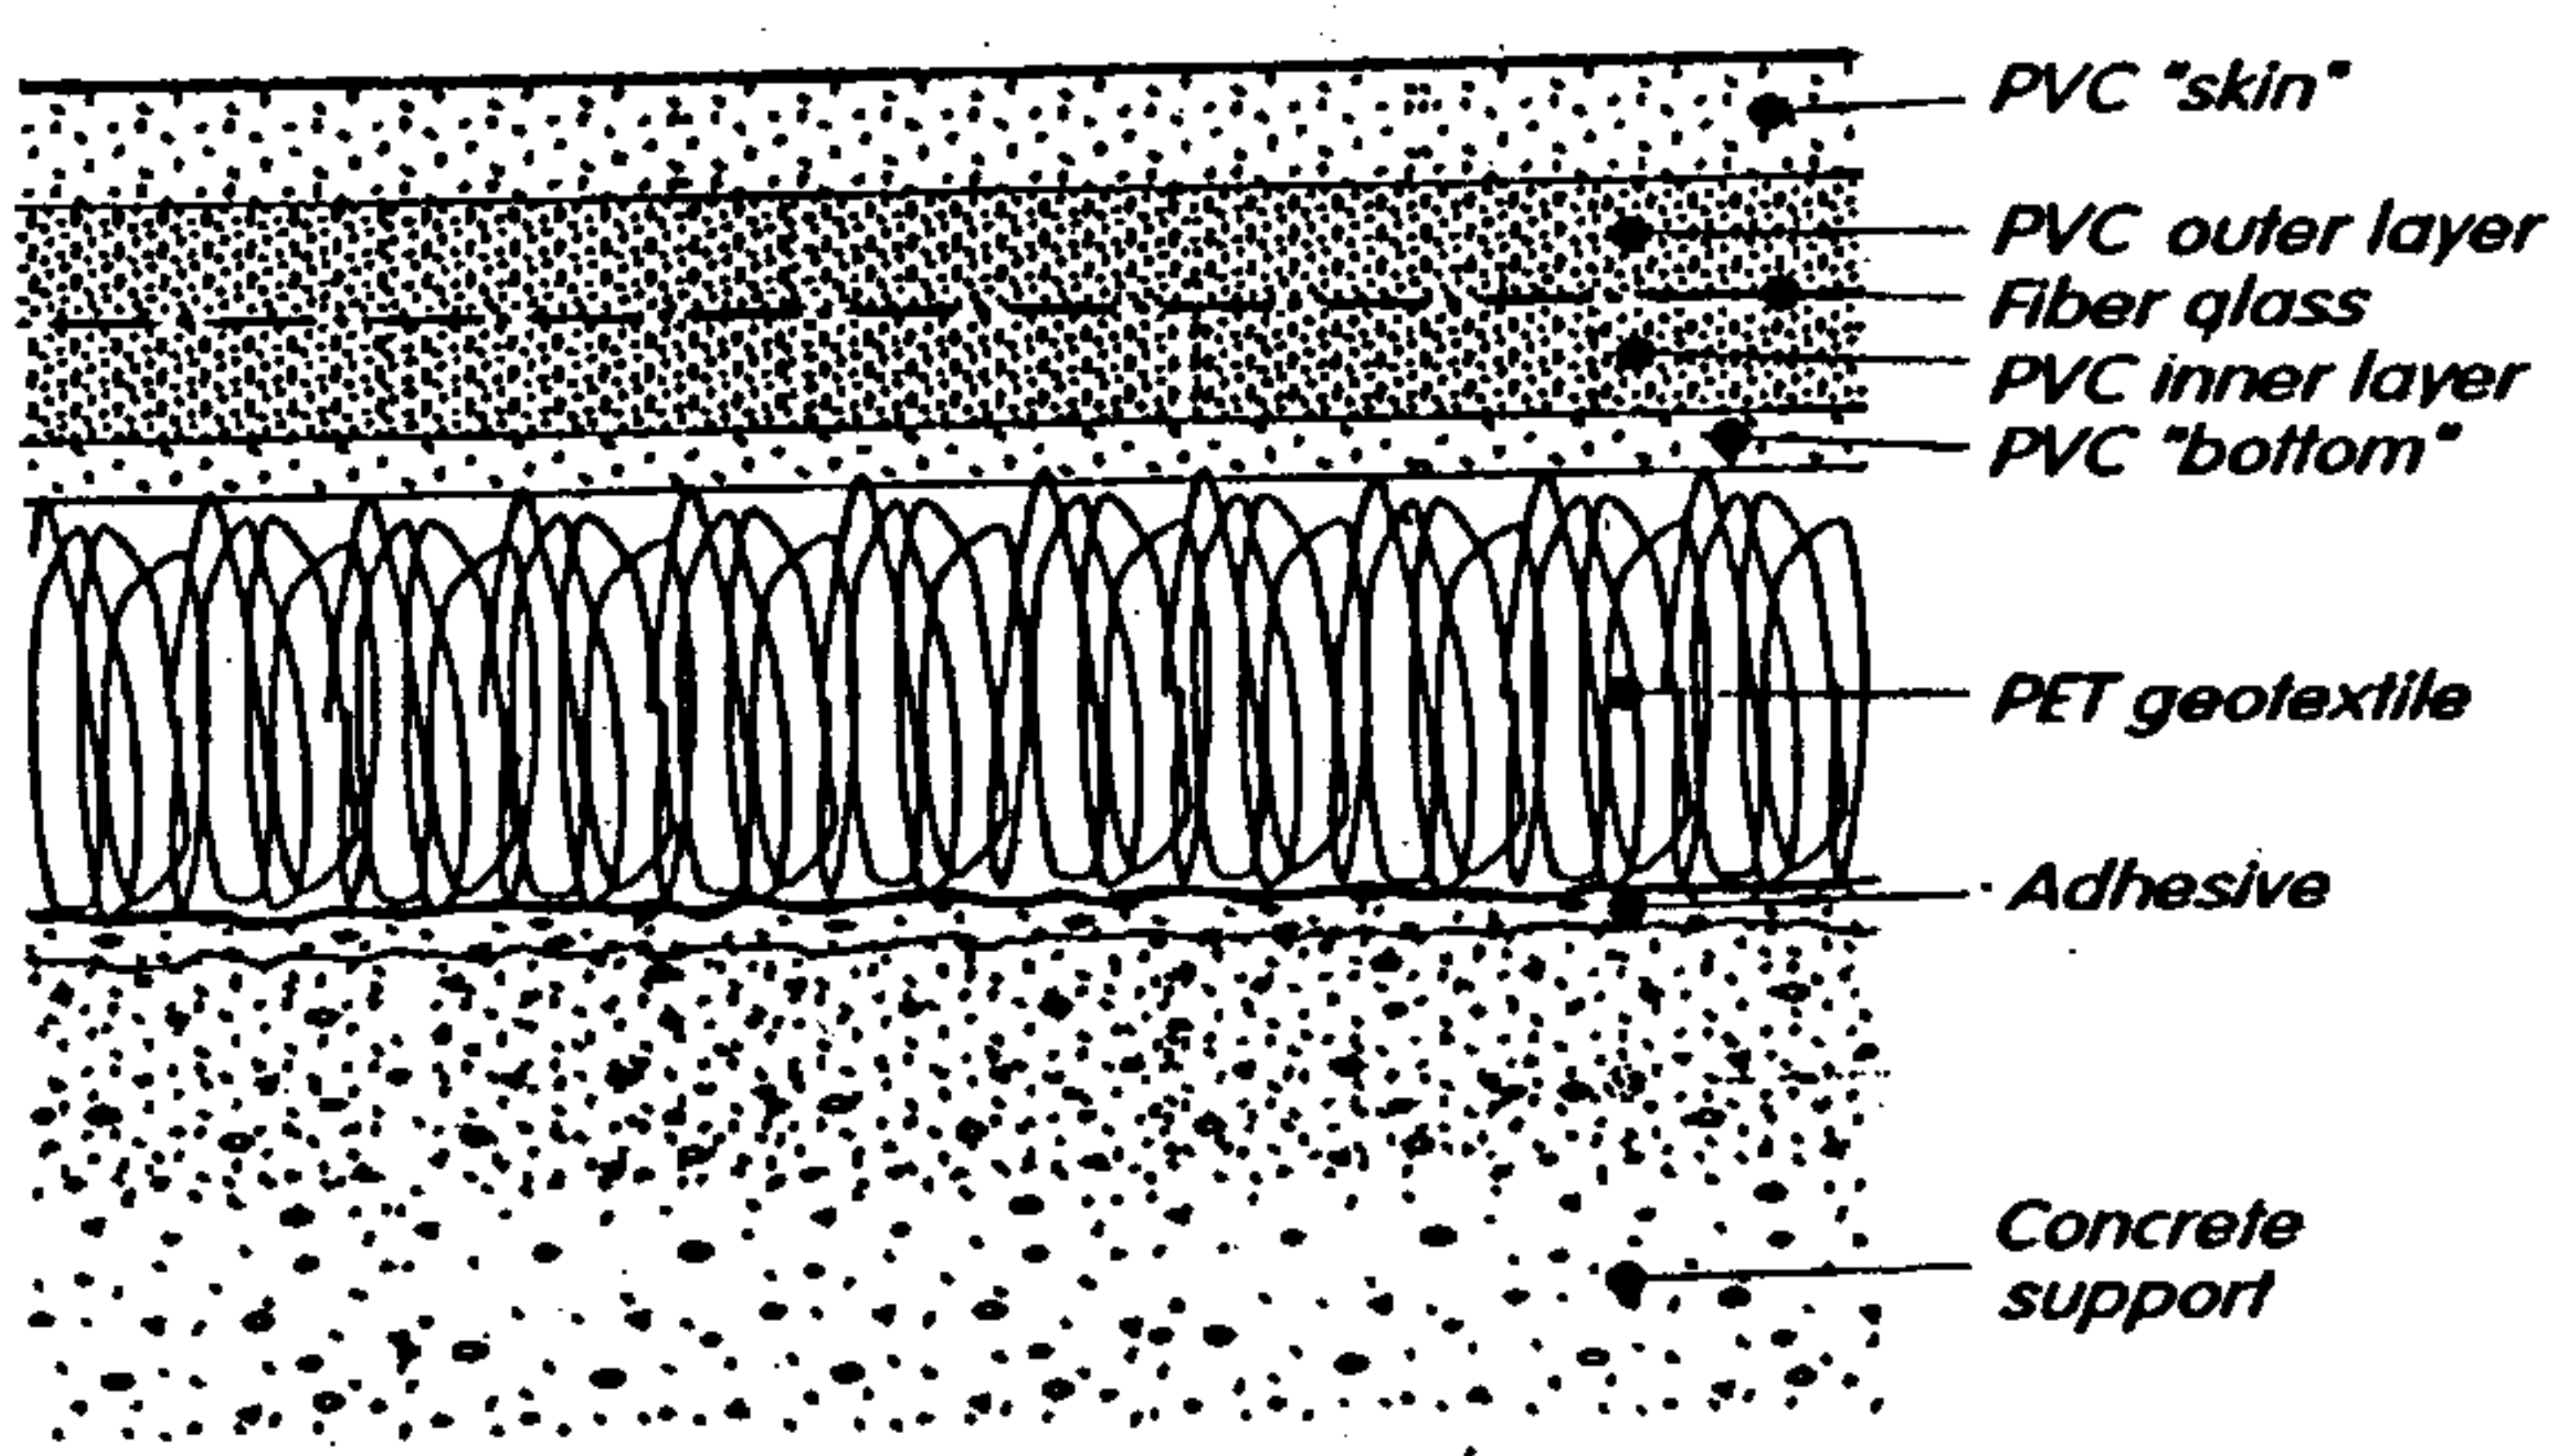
Cross-section of the system adopted for waterproofing renovation of Zolezzi dam.
